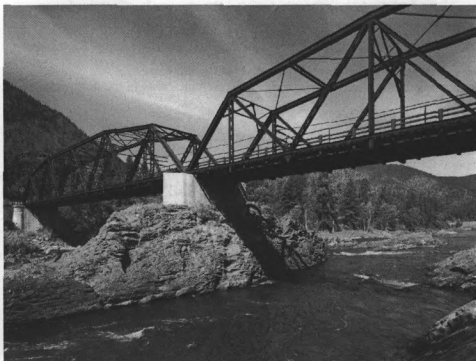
West profile of truss spans and pier located on rock. View to the northeast.
